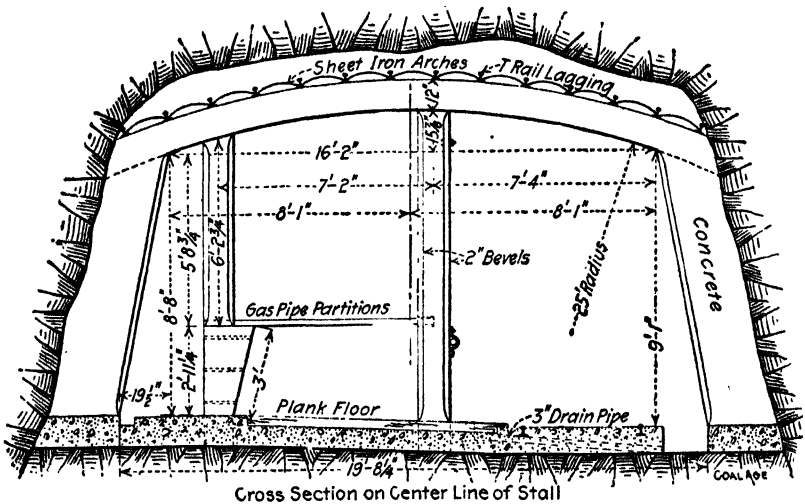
Cross section of stable shown in Fig. 5 showing manger and drainage system.
